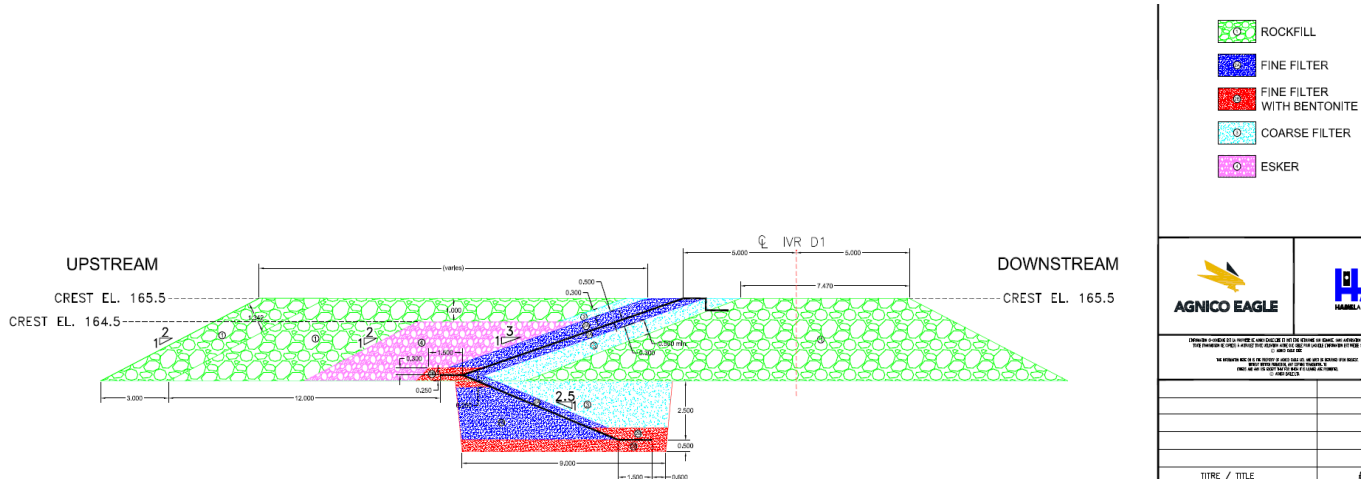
Typical Cross-Section of IVR Dike D-1 (0+080 to 0+320)
